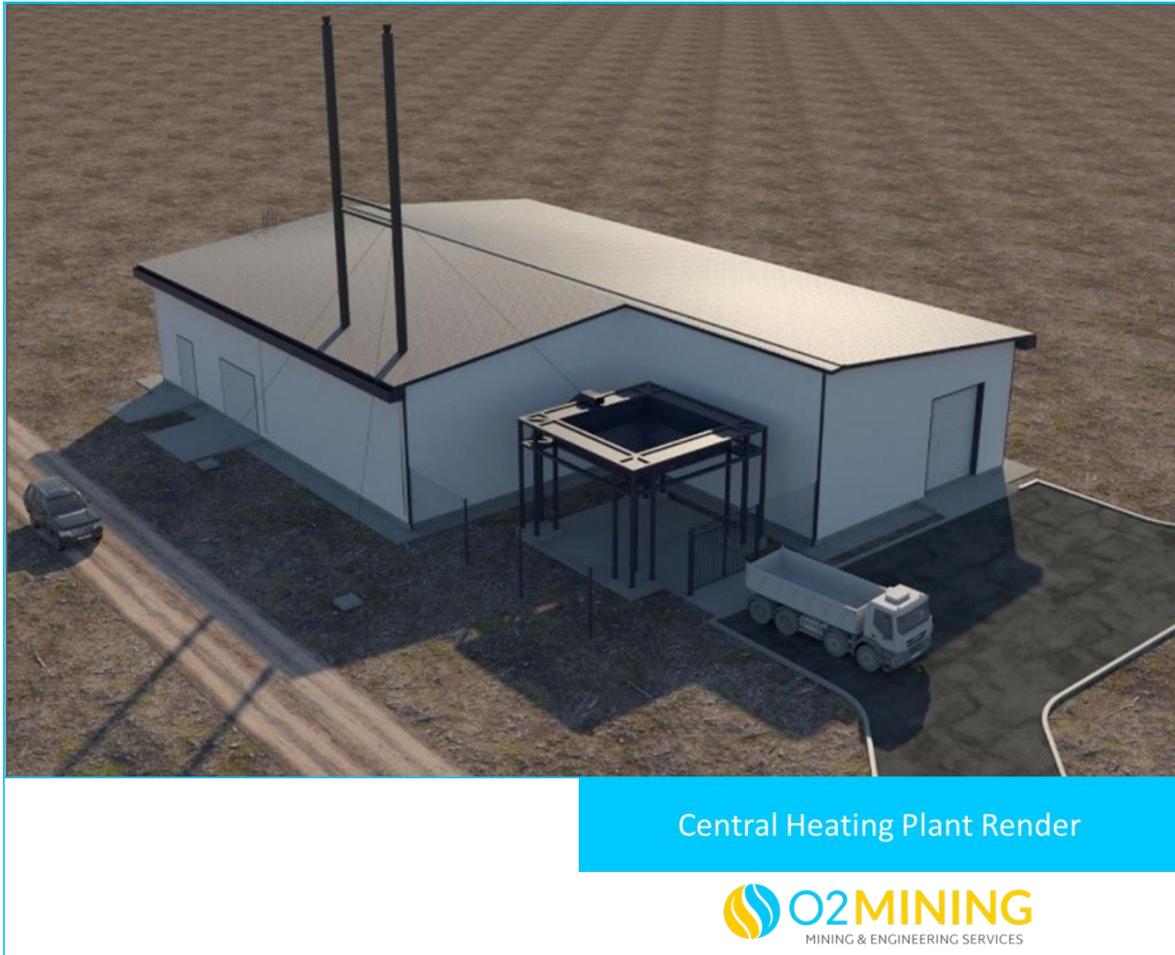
Central Heating Plant Render (Source O2 2023)
